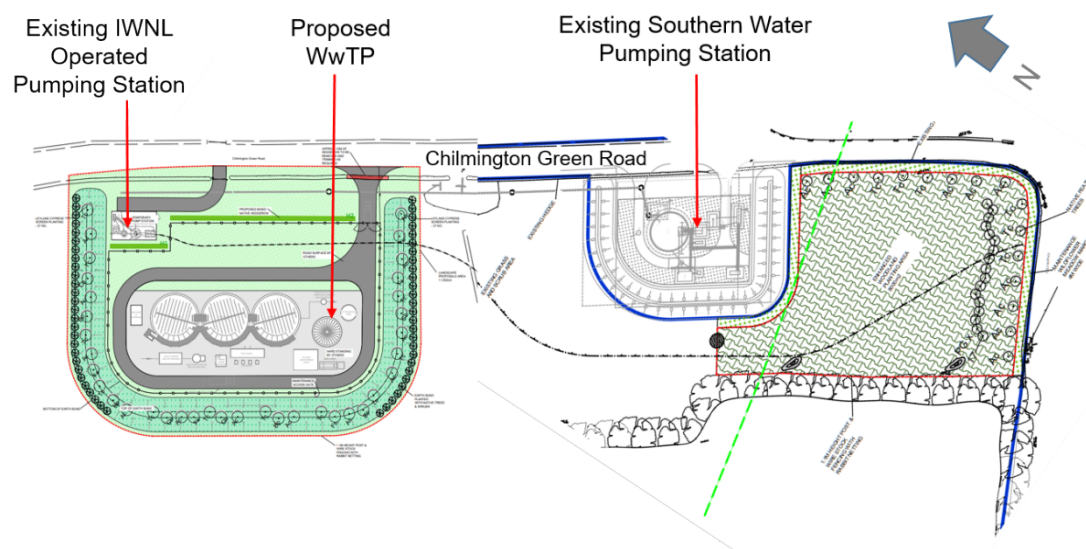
Location of existing pumping stations and proposed WwTP on Chilmington Green Road.
